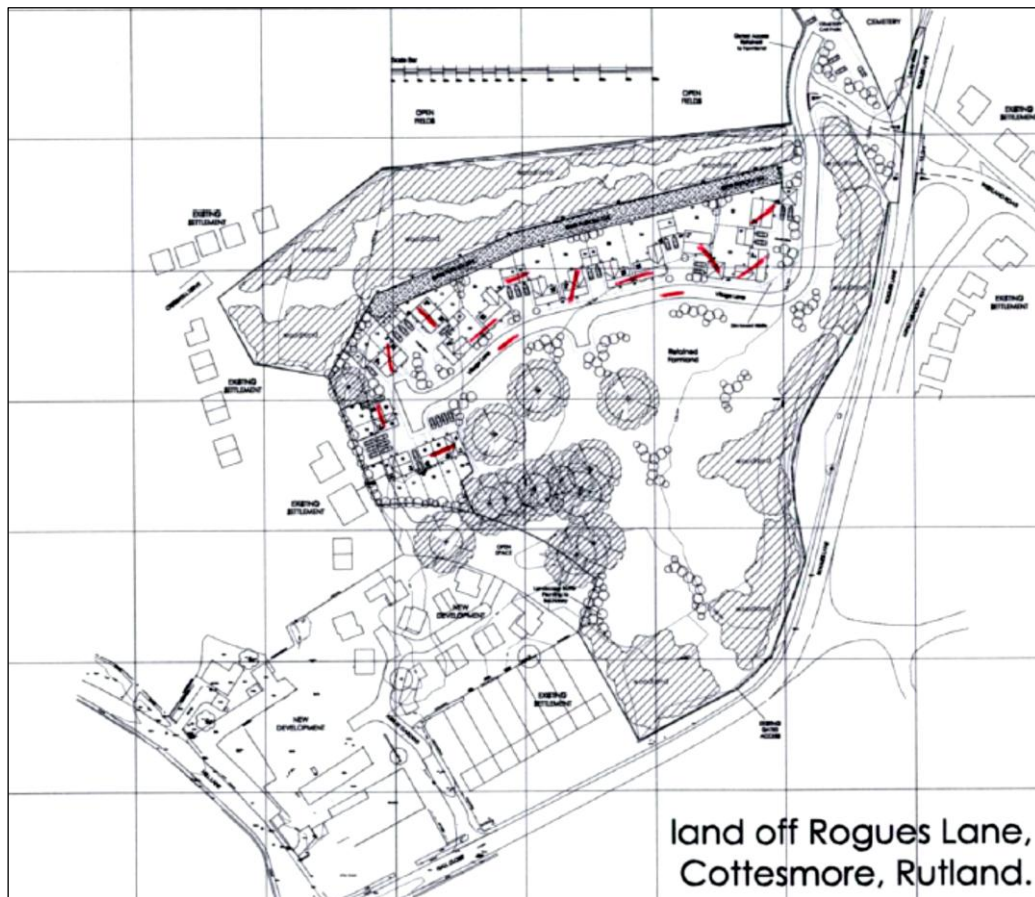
Client plan showing site location, proposed development and WSI trench layout.
